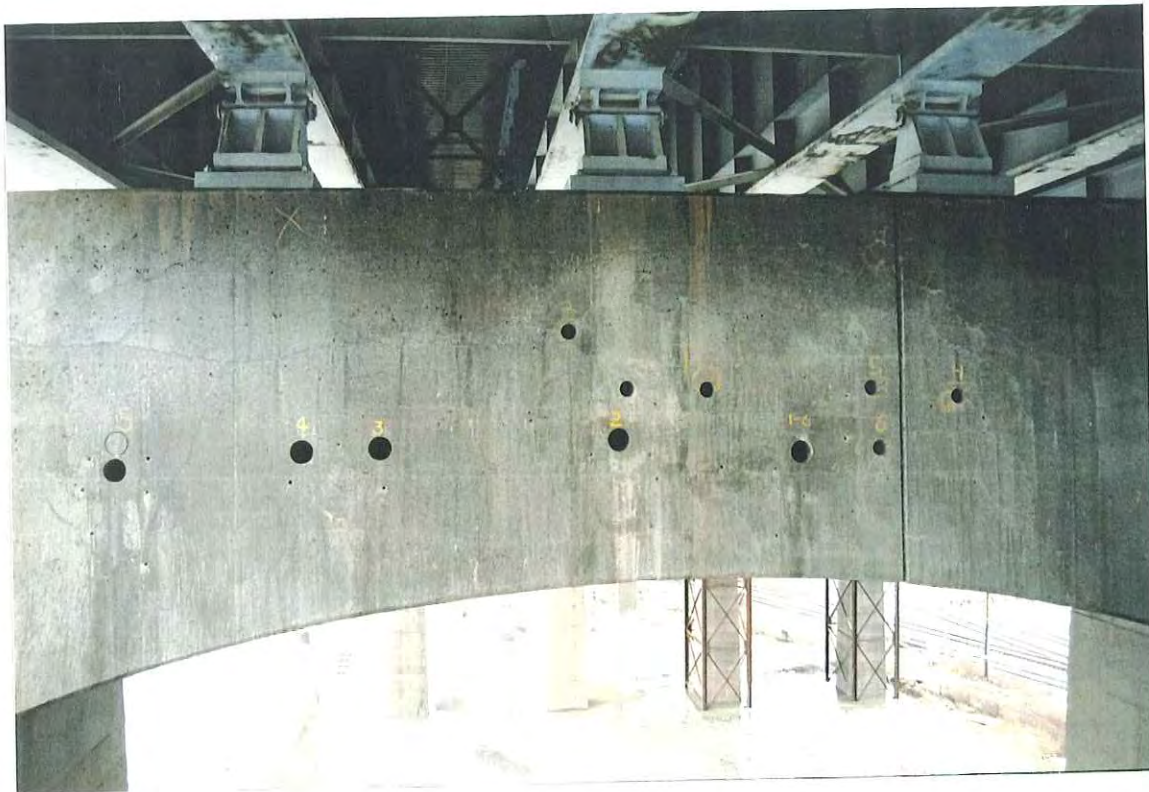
North face of Pier 38 north-bound showing core locations. One additional core was taken from the column at the left of the photo.
